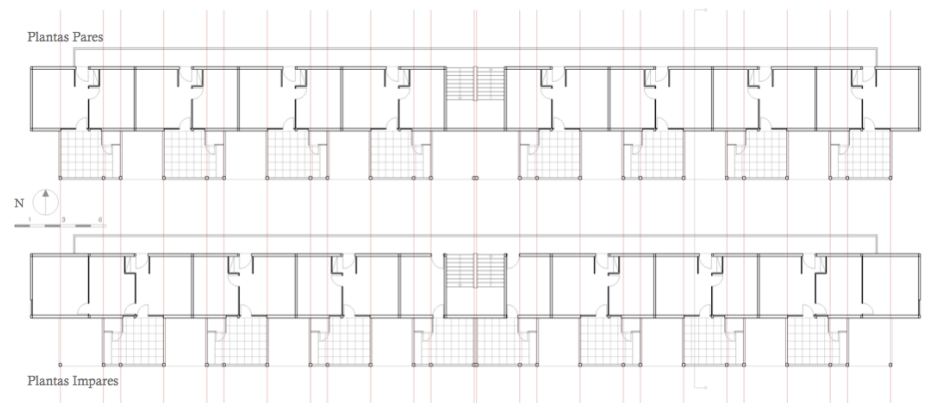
'Nid d'Abeille': Second floor (above) and third floor (below). Author's drawing, 2018.
